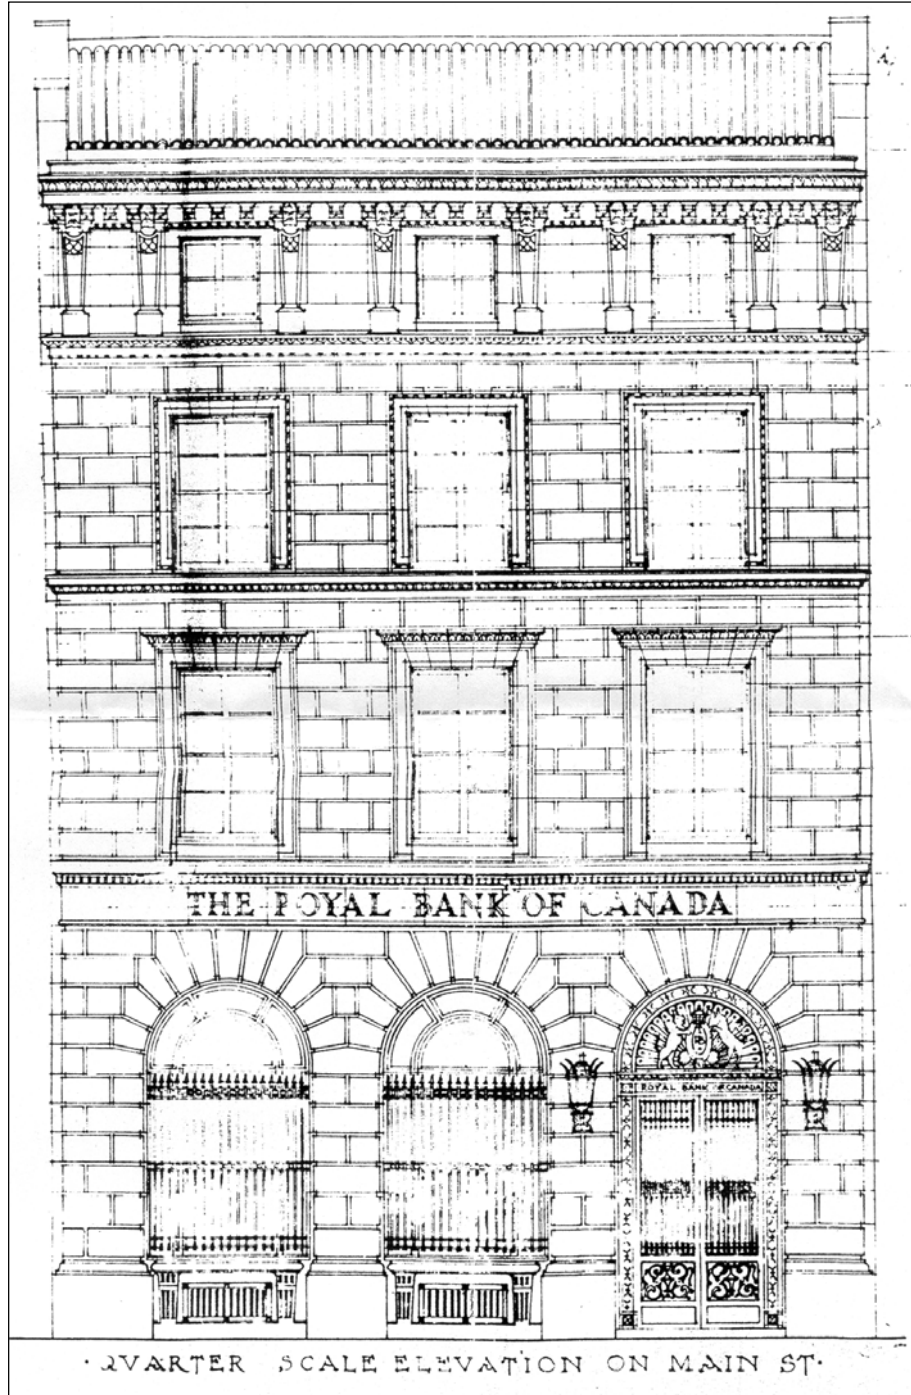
Architecture’s plans, “Quarter Scale Elevation on Main St.,” 1909. (City of Winnipeg Archives, Plan #402/1909.)
